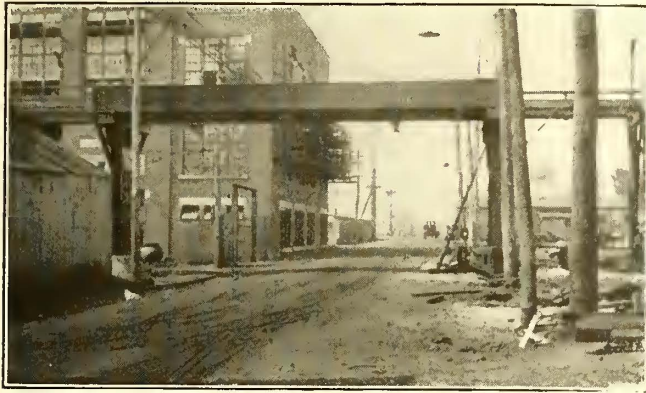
BRIDGE OVER MANUFACTURERS' RAILROAD AND DRIVE
